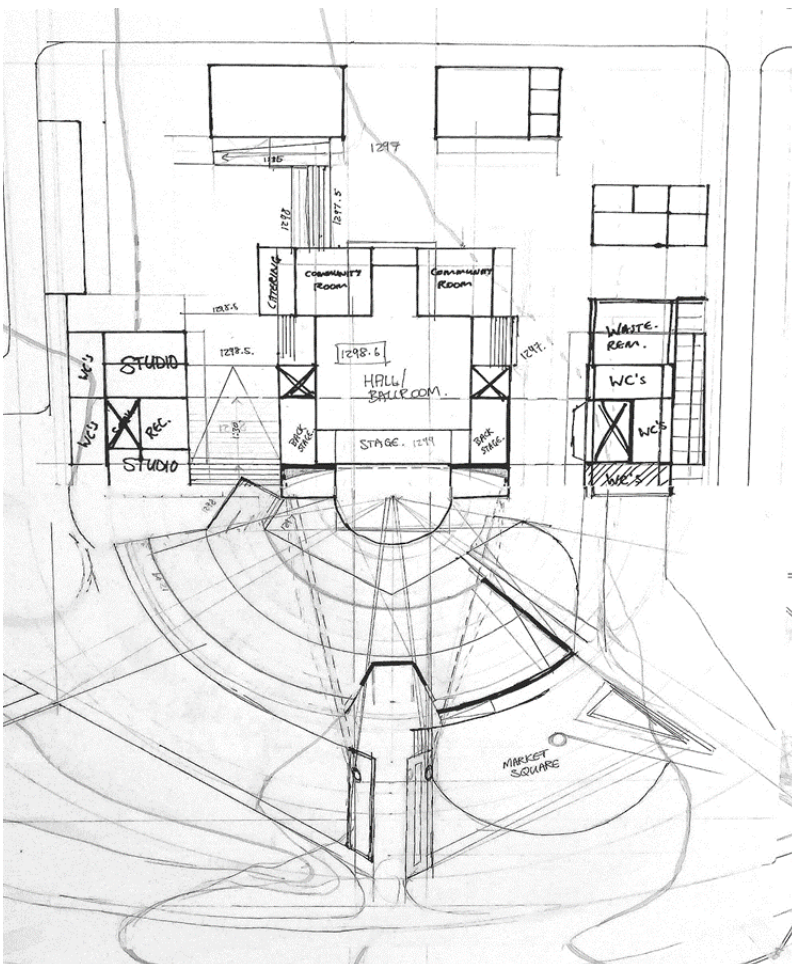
Early design: Plan diagram of proposed intervention (Author 2020)
